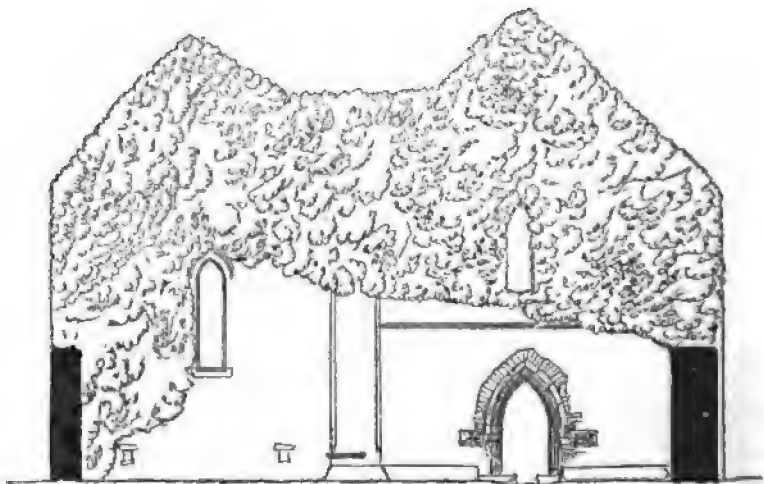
Priory of St. Columba, Co. Down.—West Elevation.
